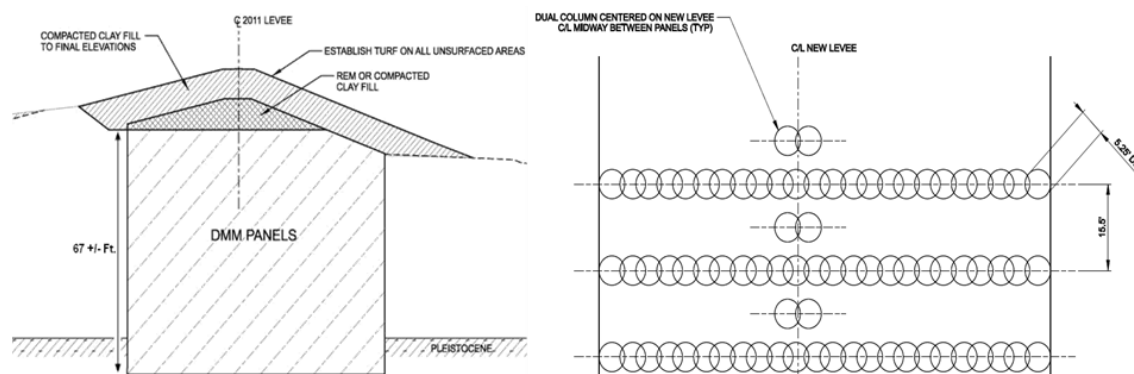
Typical design of DMM stabilization at LPV111 (cross section & plan view), after Leoni and Bertero (2012)
